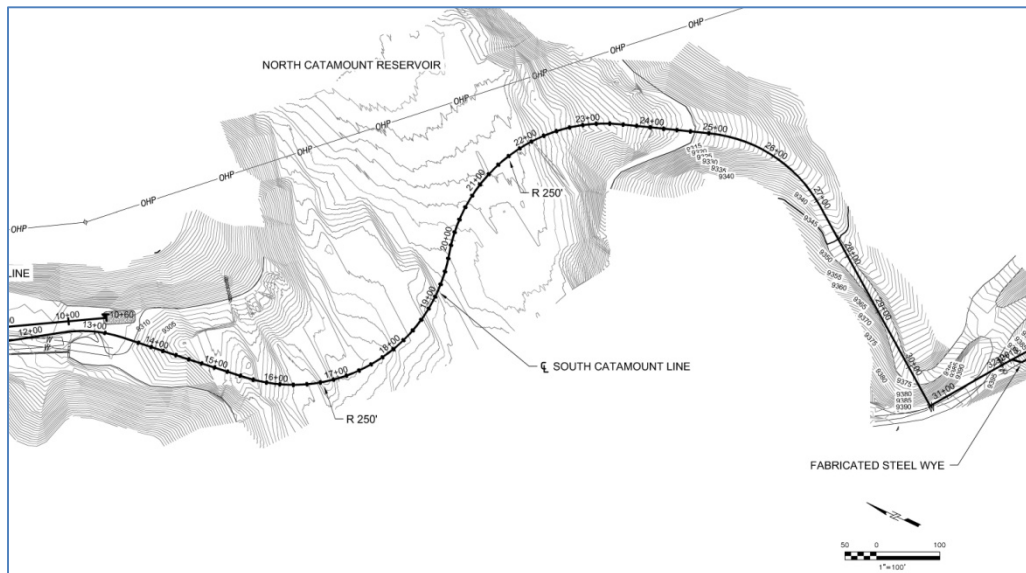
Plan of alignment for float-and-sink crossing of North Catamount Reservoir.
